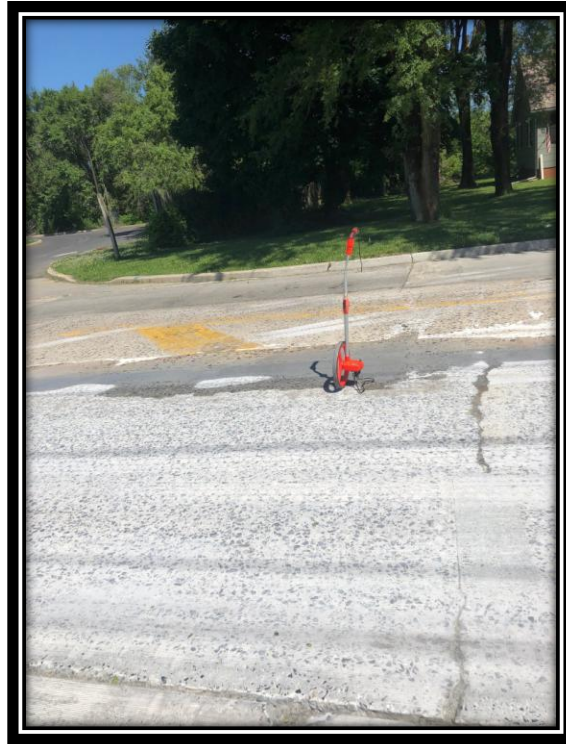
Newly diamond ground concrete surface course in the northbound lane between Erial-New Brooklyn Road and Sawood Drive
